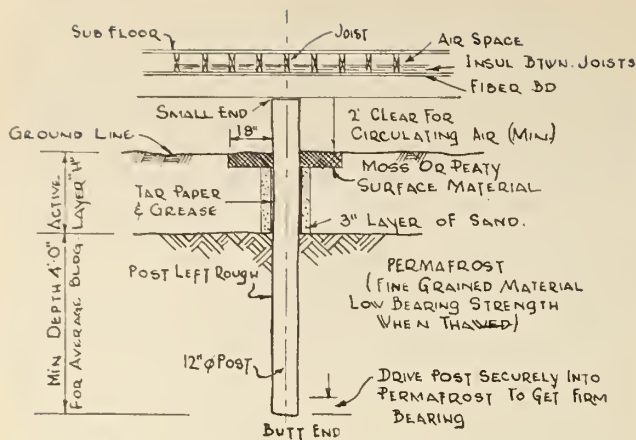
Wood pile construction Type B. Free circulation of air permitted under building.
